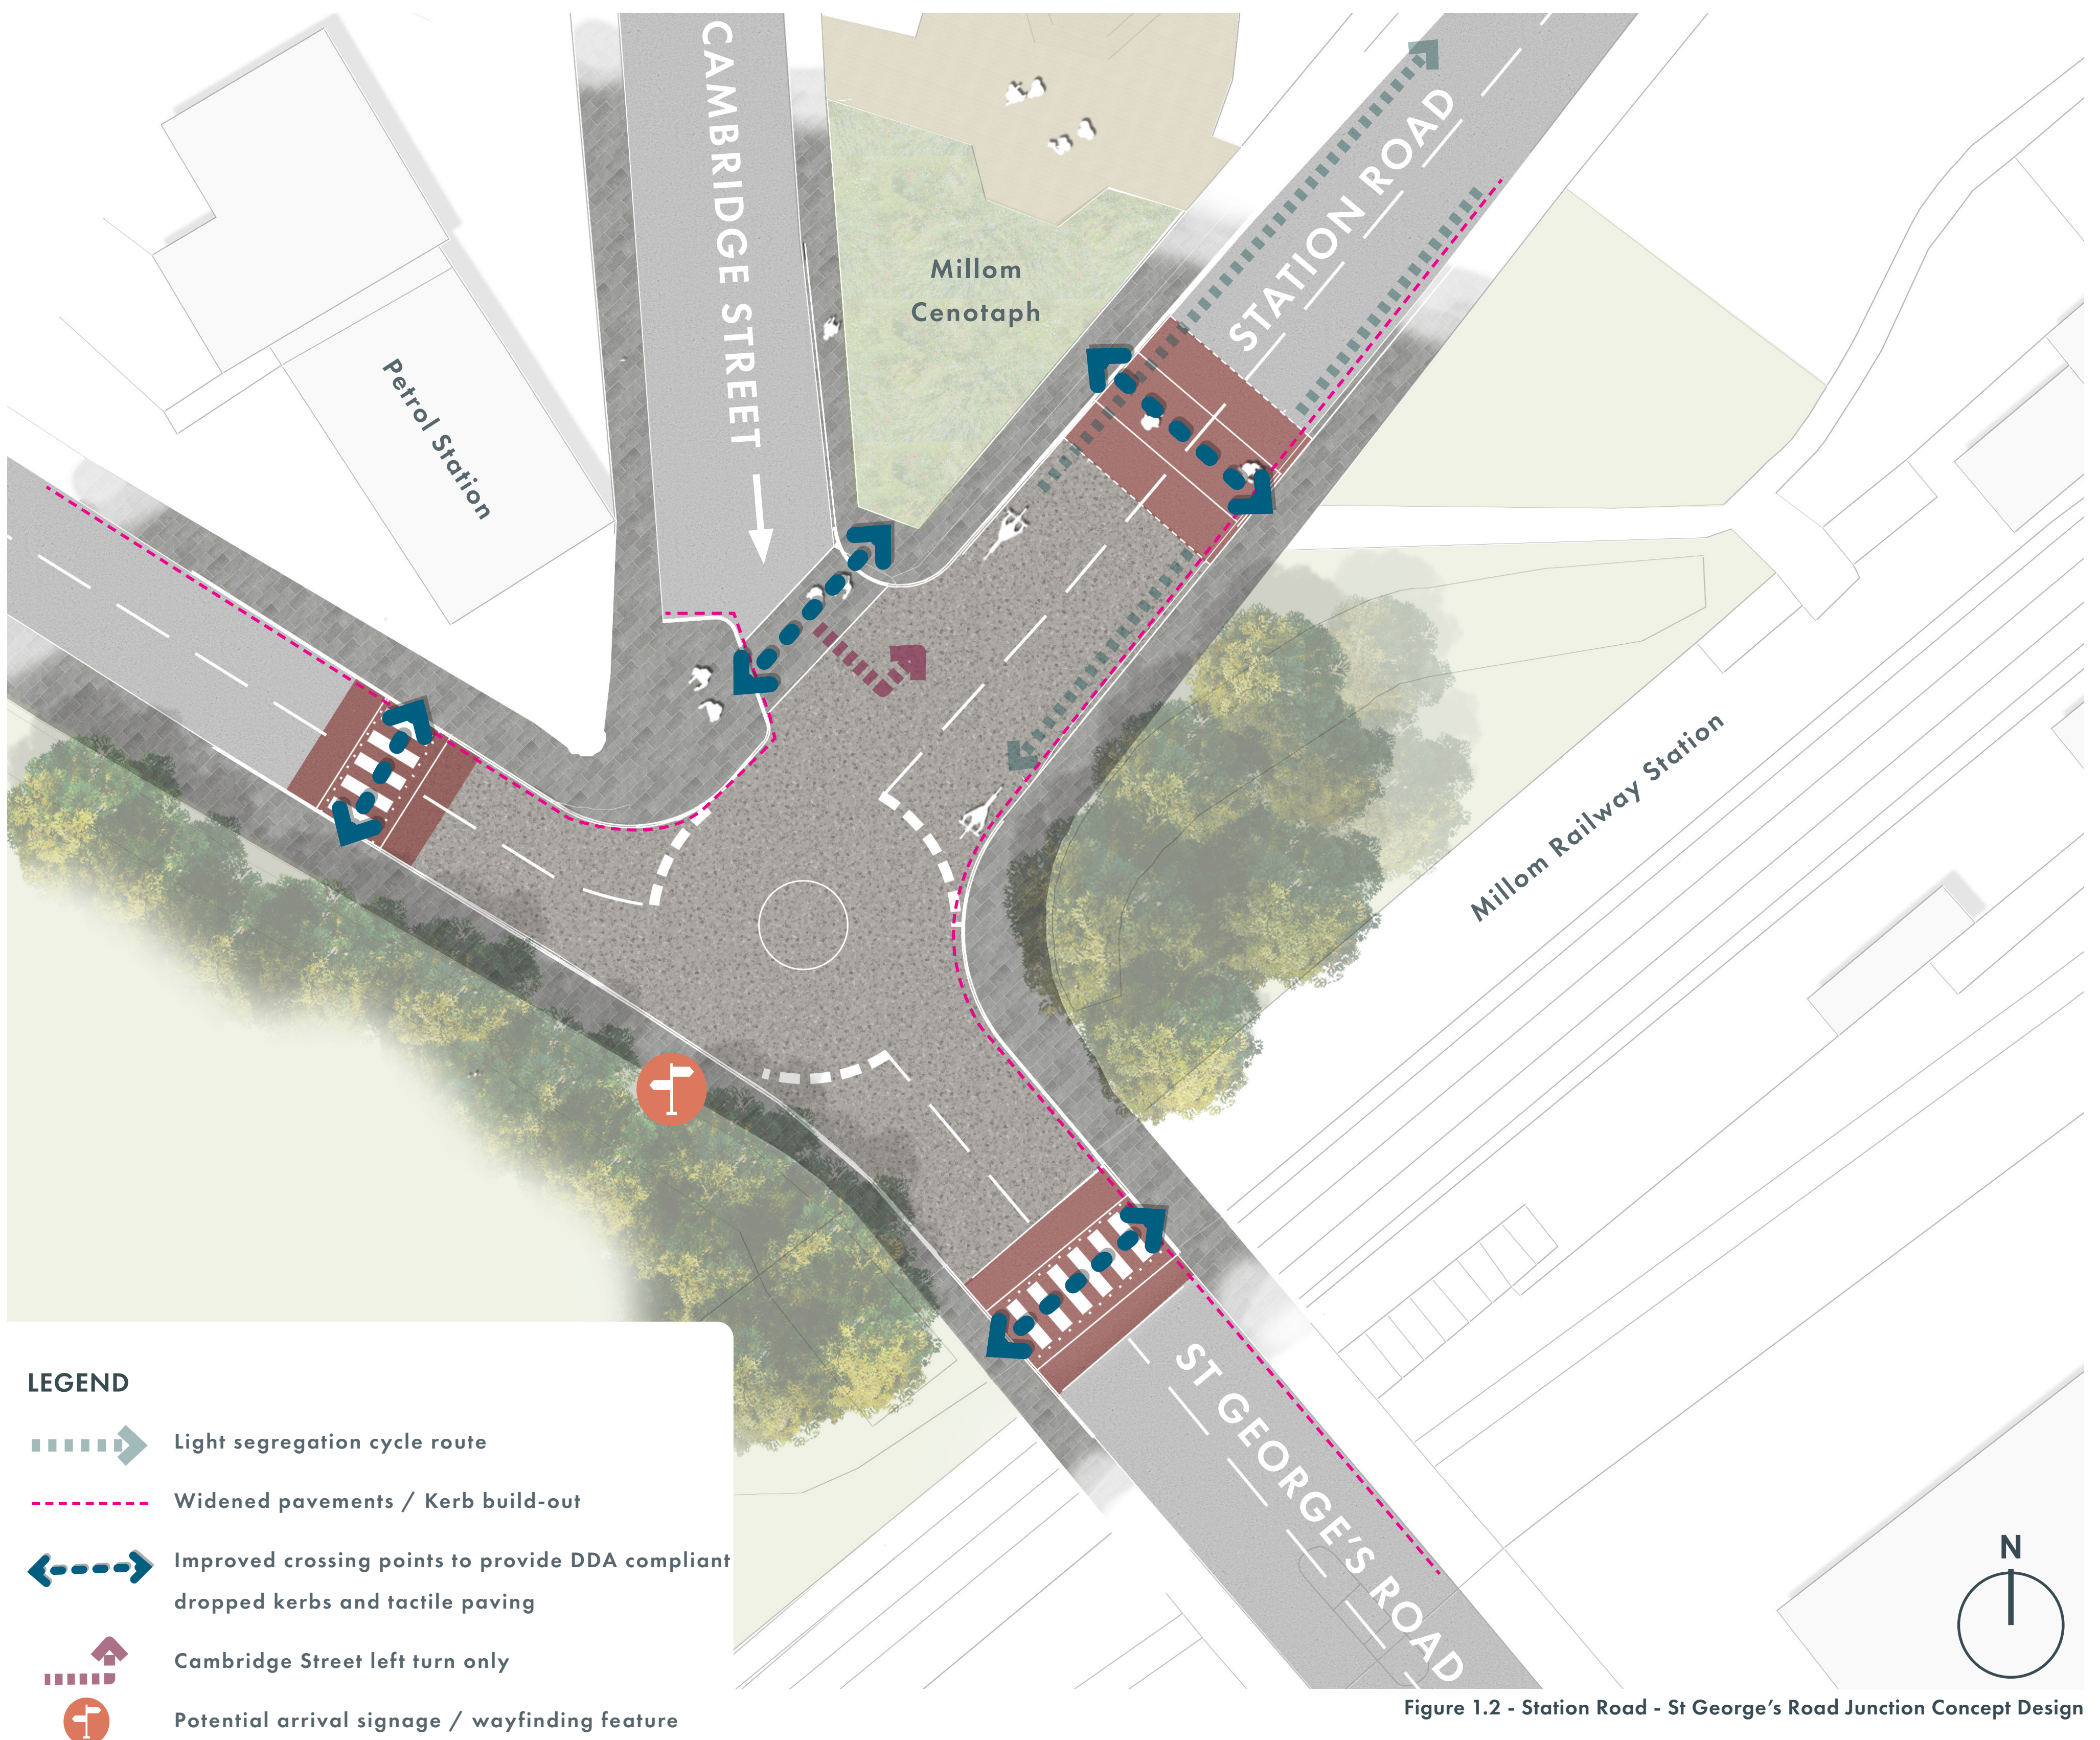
Station Road - St George's Road Junction Concept Design
